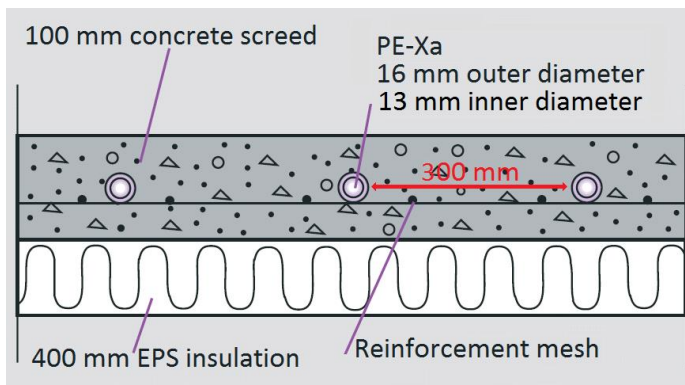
Concrete screed embedded pipe under floor heating (EnovHeat case study house).
